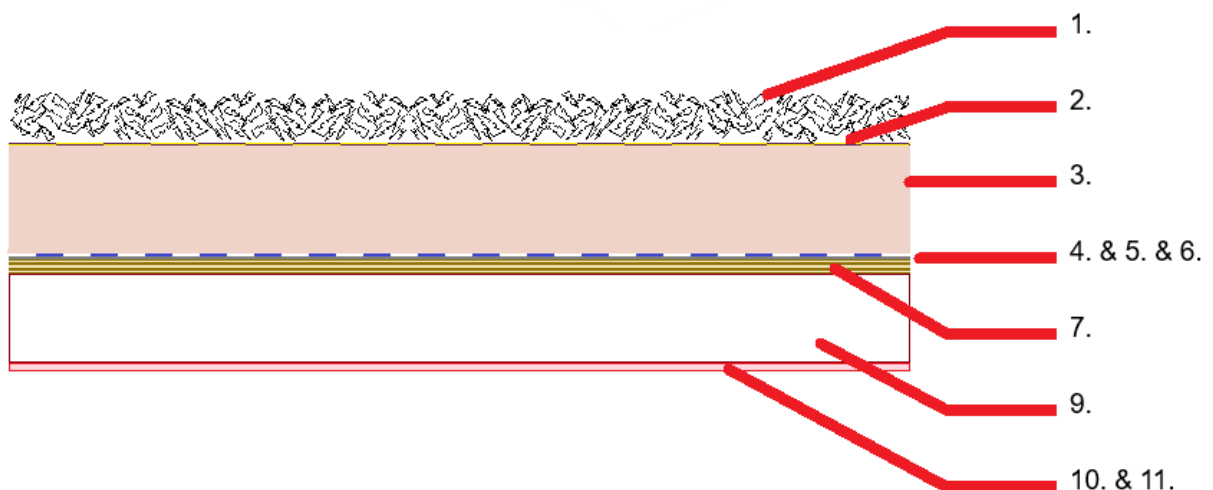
Construction type 3 – *inverted roof*, comprising 50 mm of ballast, 160 mm thick extruded polystyrene insulation which is placed on a fleece isolation layer laid dry over the EPDM (firrings not shown for ease of drawing)
